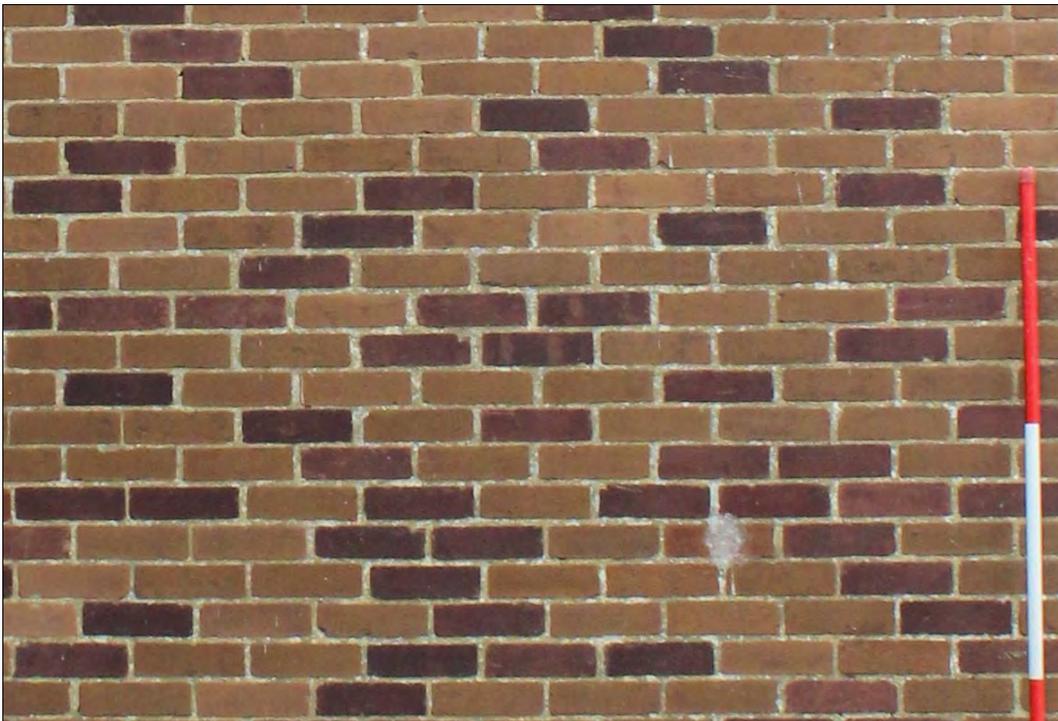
Typical brickwork pattern used in barracks. Scale 0.5m divisions
